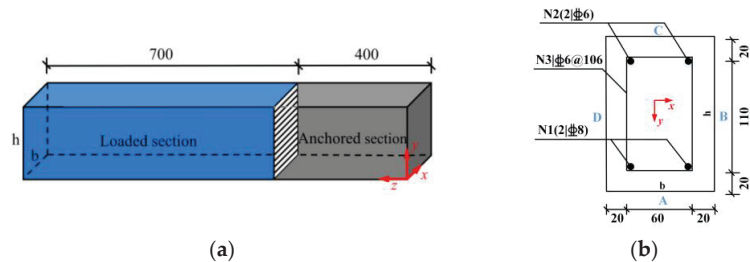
Diagrammatic sketch of the dimensions and section reinforcement of the test piles (unit: mm). (a) Dimensions; (b) section reinforcement.
